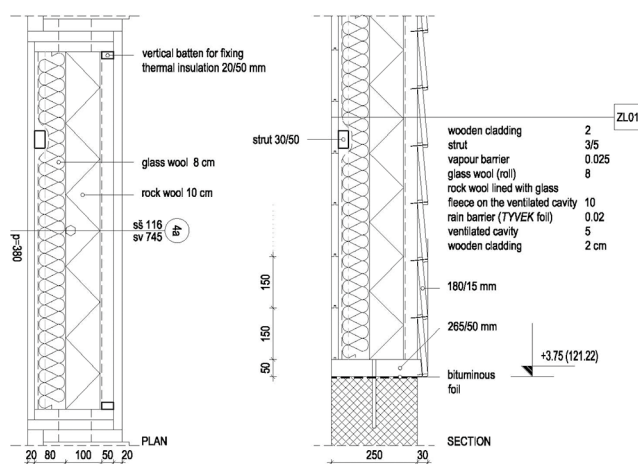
Section of the perimeter wooden walls showing the application of thermal insulation and supporting layers within the originally hollow cavity of wooden panels.
